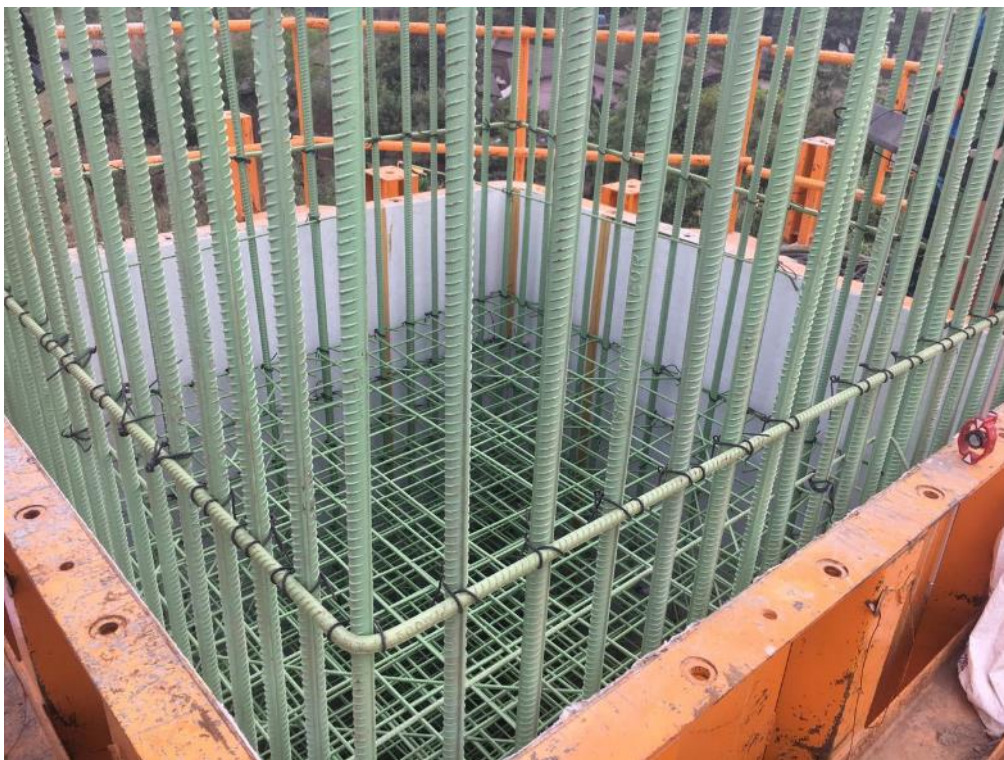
Pier reinforcement and shuttering at RMP 269 is in progress
